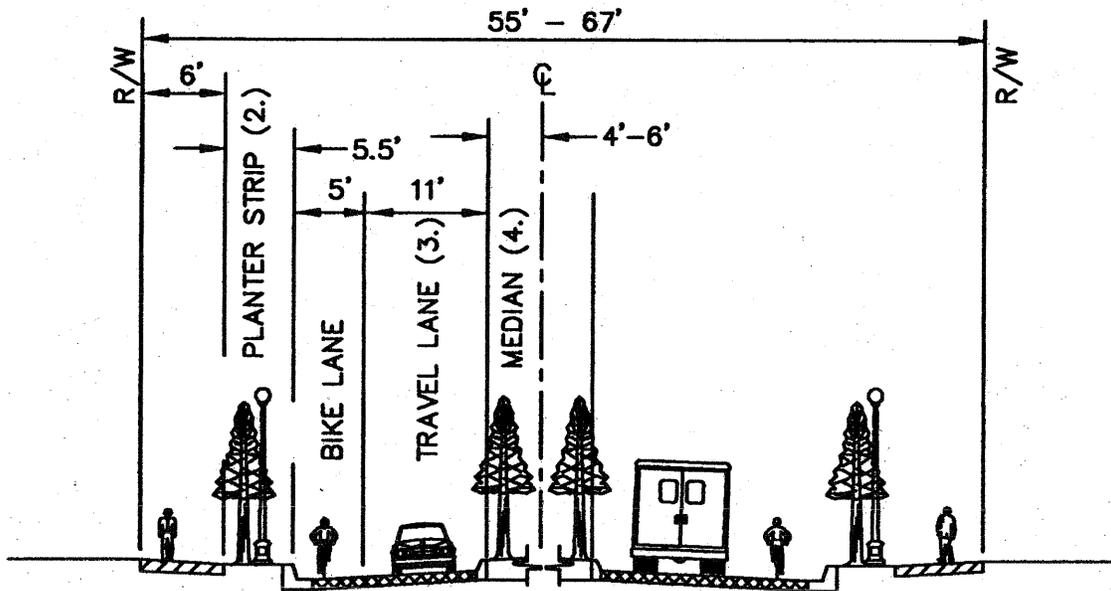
Conceptual Sammamish Town Center street cross-sections.
